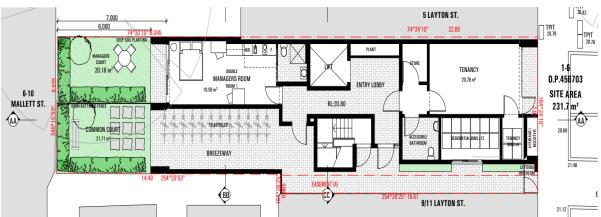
Ground floor layout of proposed development Source: Prescott Architects
